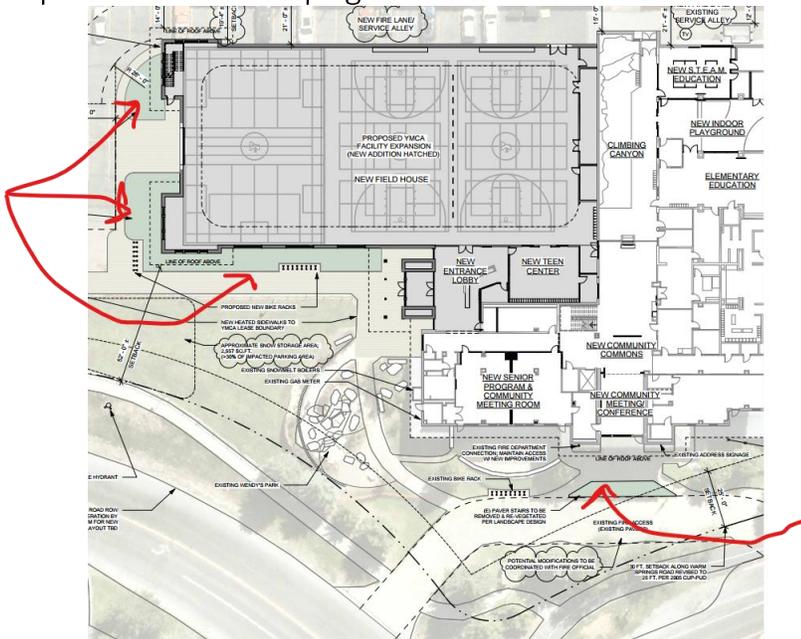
Site Plan(Sheet A1) highlighting areas to be landscaped
